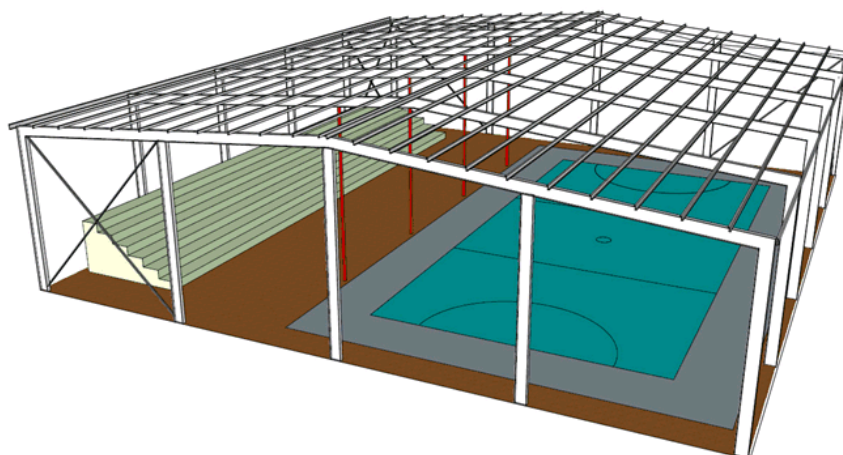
Indicative floor plan and structural layout of remediated stadium.
